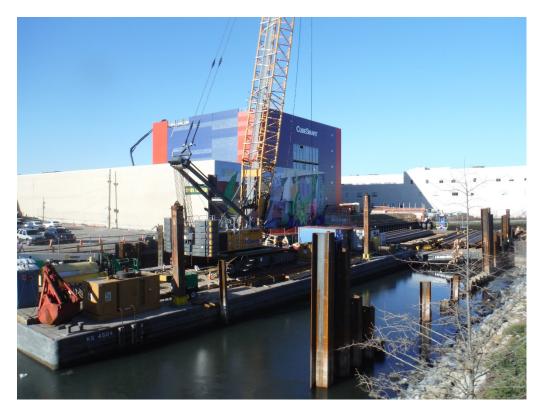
Photo of the Crane and Barges Necessary to Perform the Sheet Pile Installation
